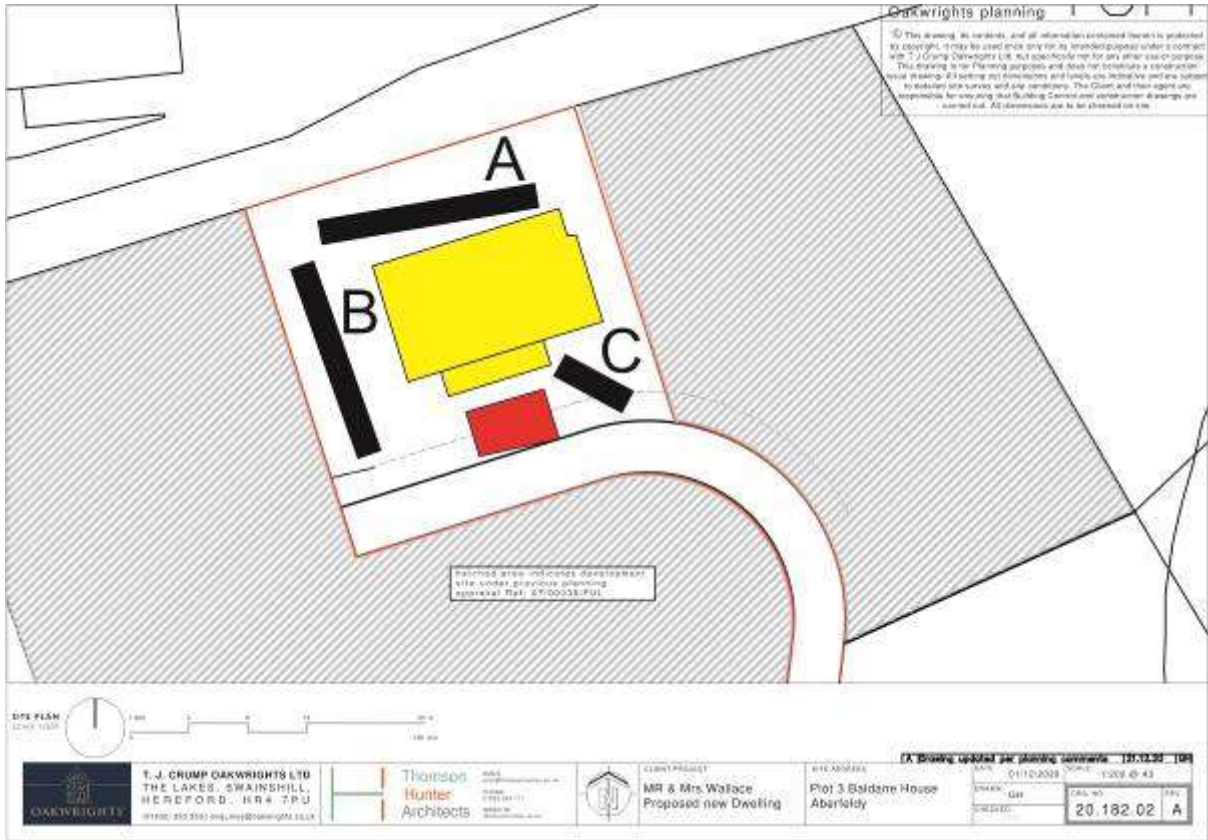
Location of evaluation trenches A, B and C, in relation to proposed house plot (yellow). Red area indicates location of buried wastewater tank.
